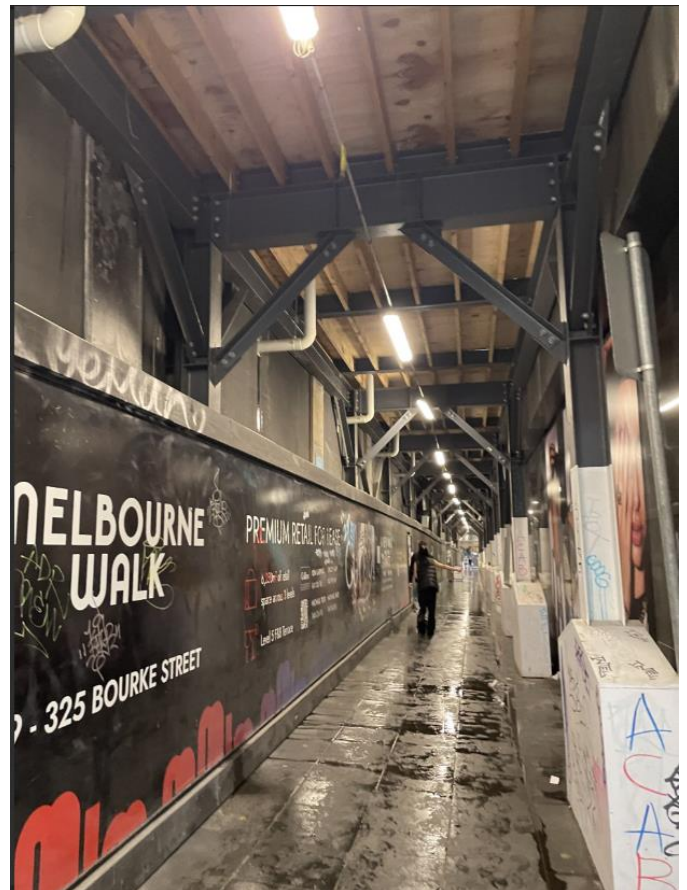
Subject site existing conditions - Bourke Street frontage and The Causeway pedestrian accessway
